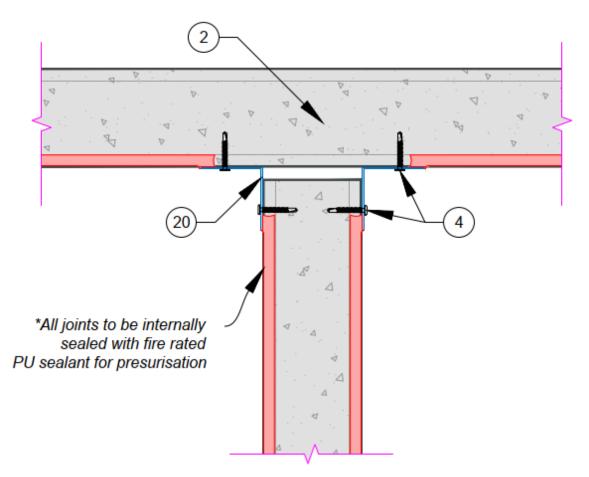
Dual void box riser – mid-wall connection when span is 4.5 m (infill panel connected to continuous panel via steel angles)
